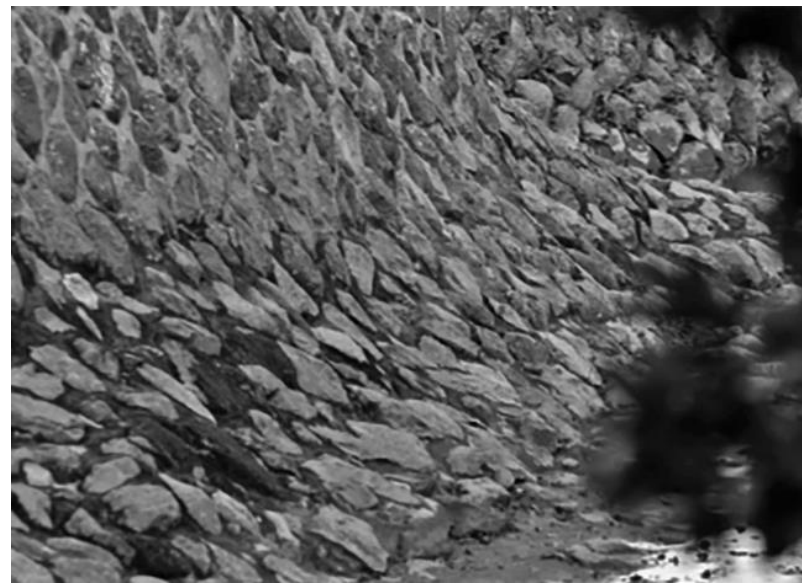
Details of the pebble foundation. (right)
